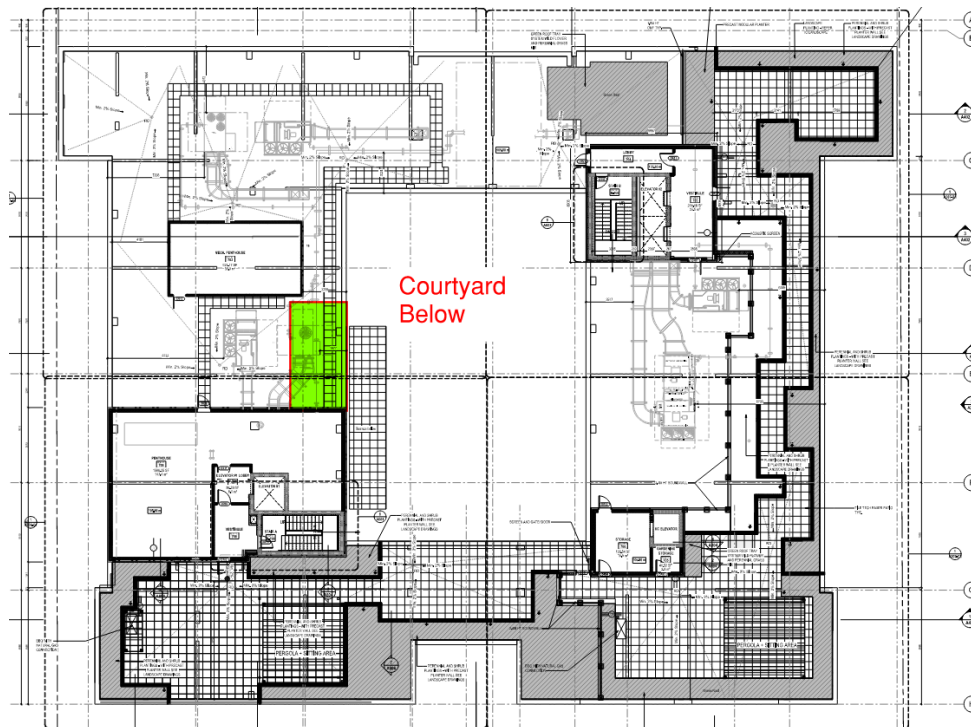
Roof Plan Excerpt with location of deficiency highlighted
